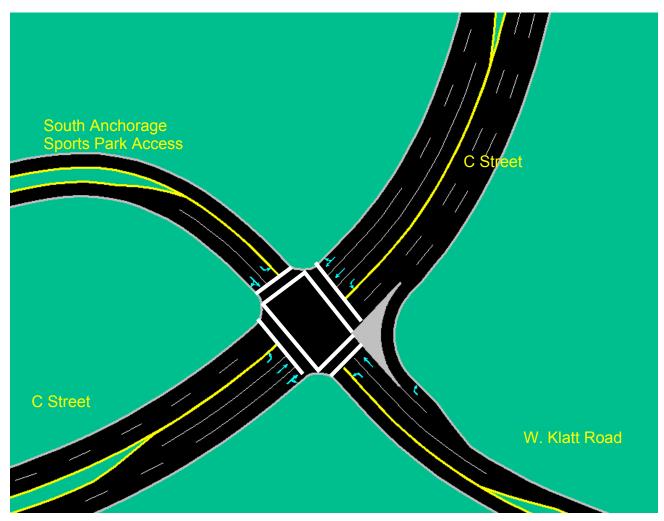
C Street/West Klatt Road/ South Anchorage Sports Park Access Signalized Lane Configuration
